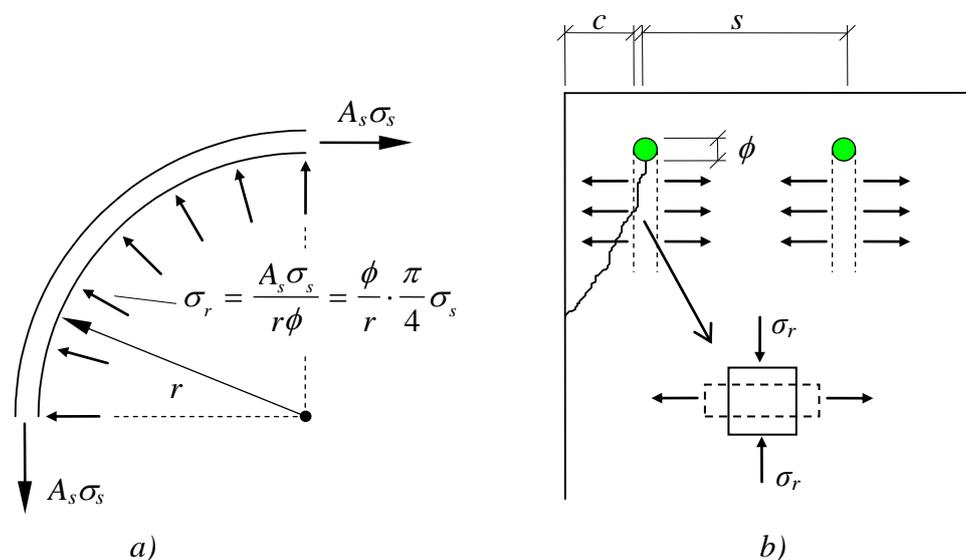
Schematic view of stresses acting on a bent reinforcing bar within a concrete member, a) radial compressive stresses, b) possible spalling cracks. The figure is based on Johansson (2000).
